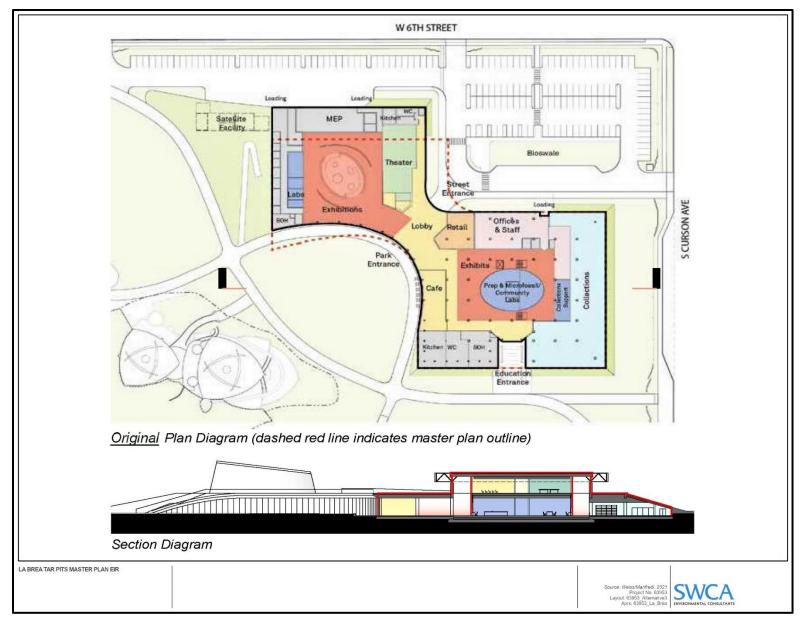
<u>Original</u> Alternative 3: Museum plan and section diagrams.
